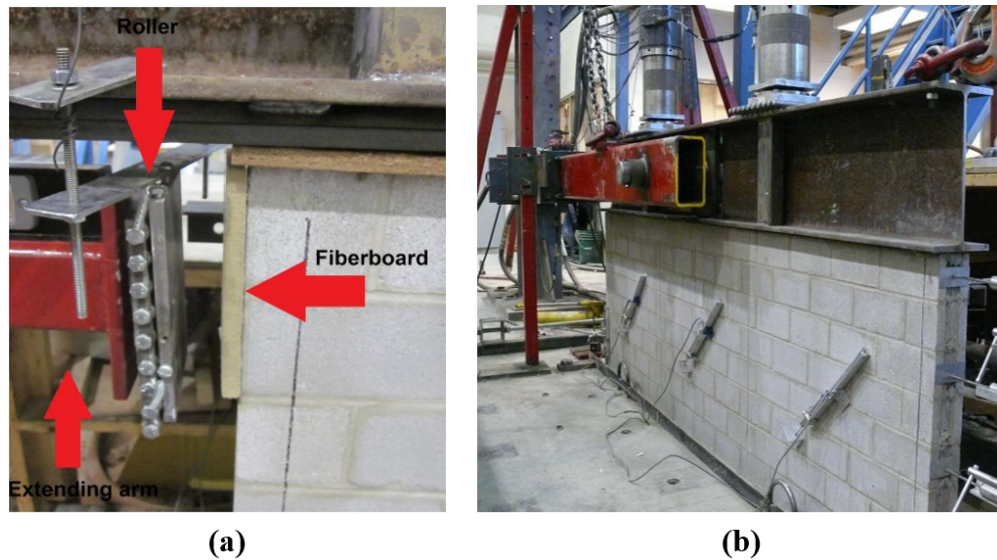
Test setup used by Hamedzadeh: (a) first four walls, (b) remaining walls (adapted from Hamedzadeh, 2013)
